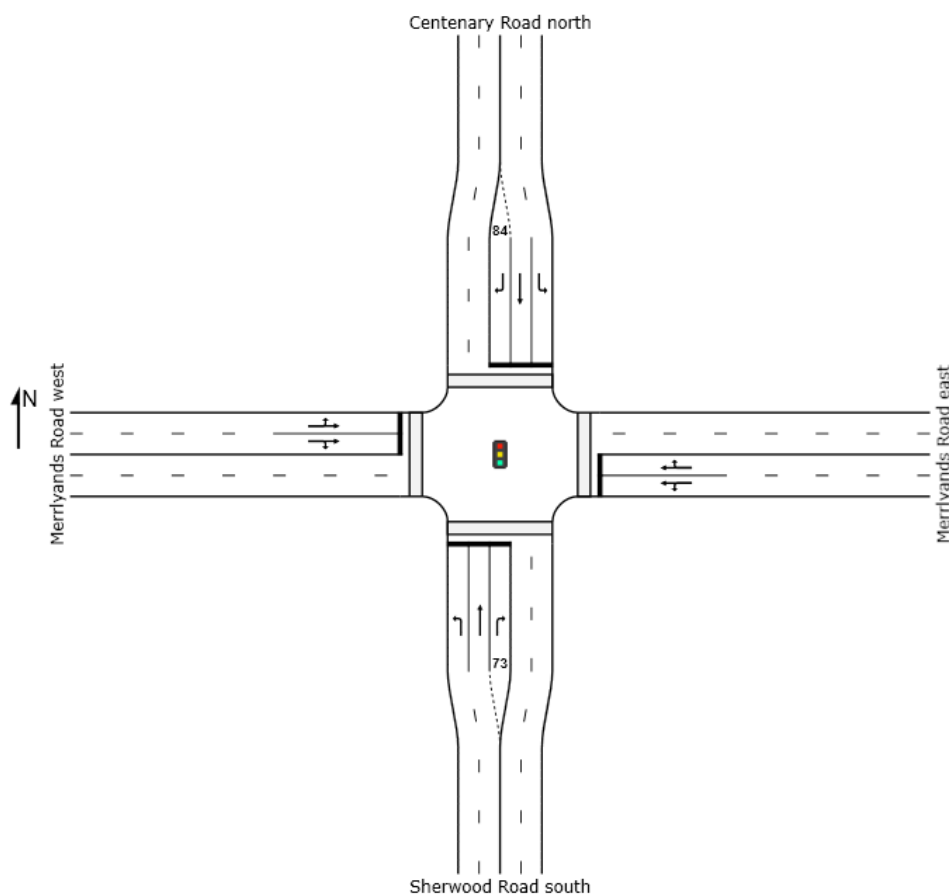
Signalised Intersection Layout of Merrylands Road with Sherwood Road and Centenary Road with (SIDRA)
